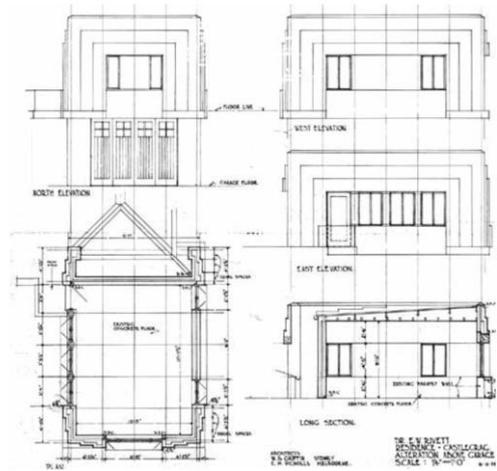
Rivett House on the Corner of Sortie Port and Edinburgh Road, Castlecrag, c1932. Source: *National Library of Australia*, <http://nla.gov.au/nla.obj-150449725>
